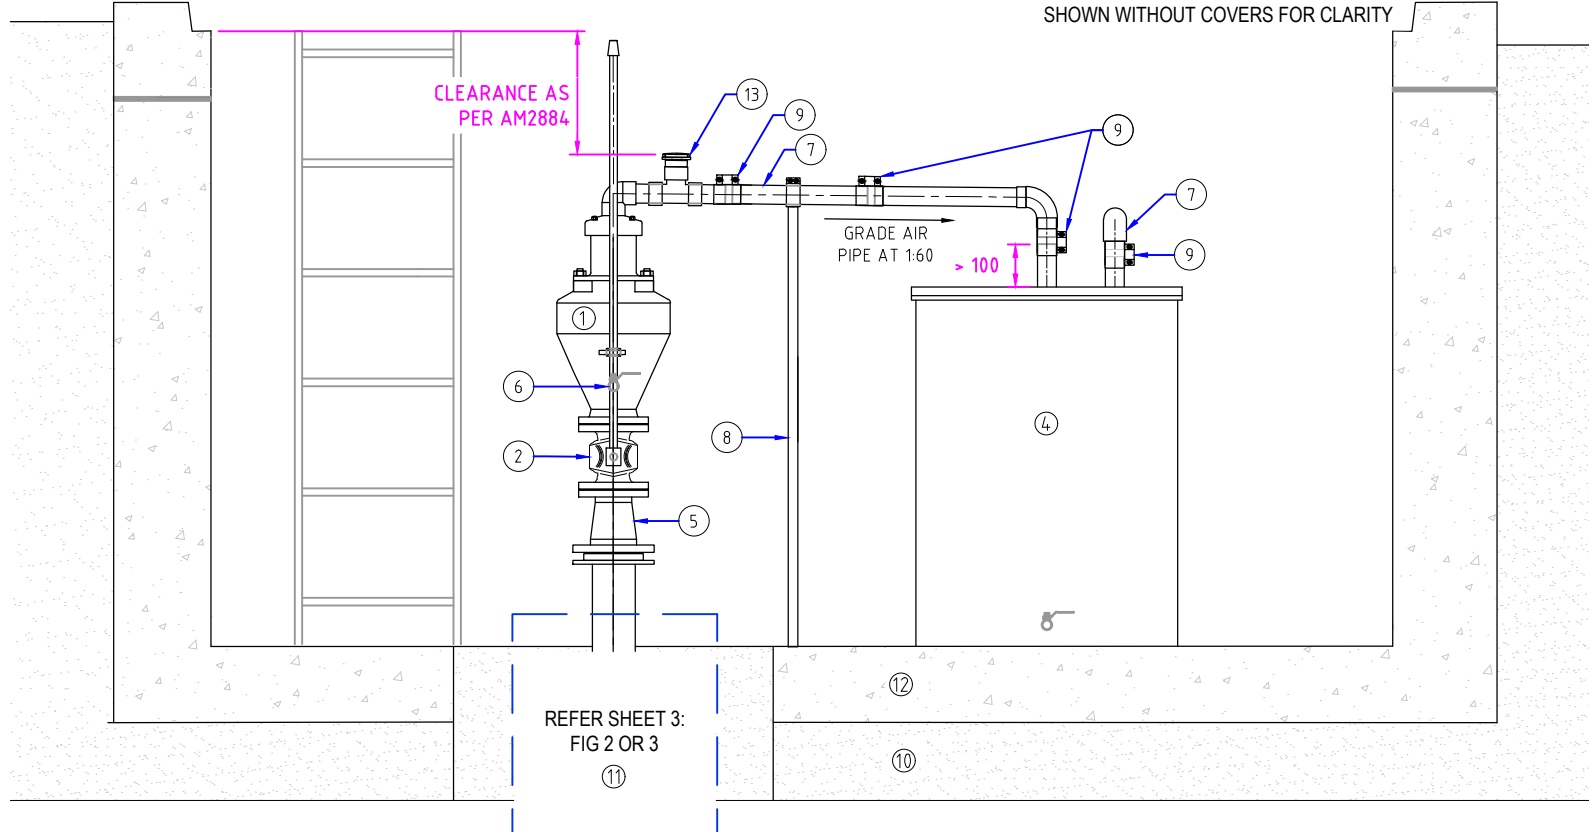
BELOW GROUND AIR VALVE AND CARBON CANISTER ASSEMBLY (SECTION A)
